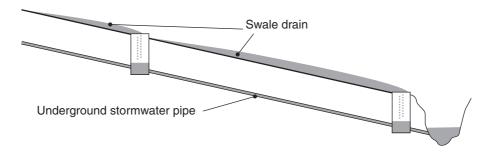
Longitudinal illustration of swale drain/underground pipe system.
